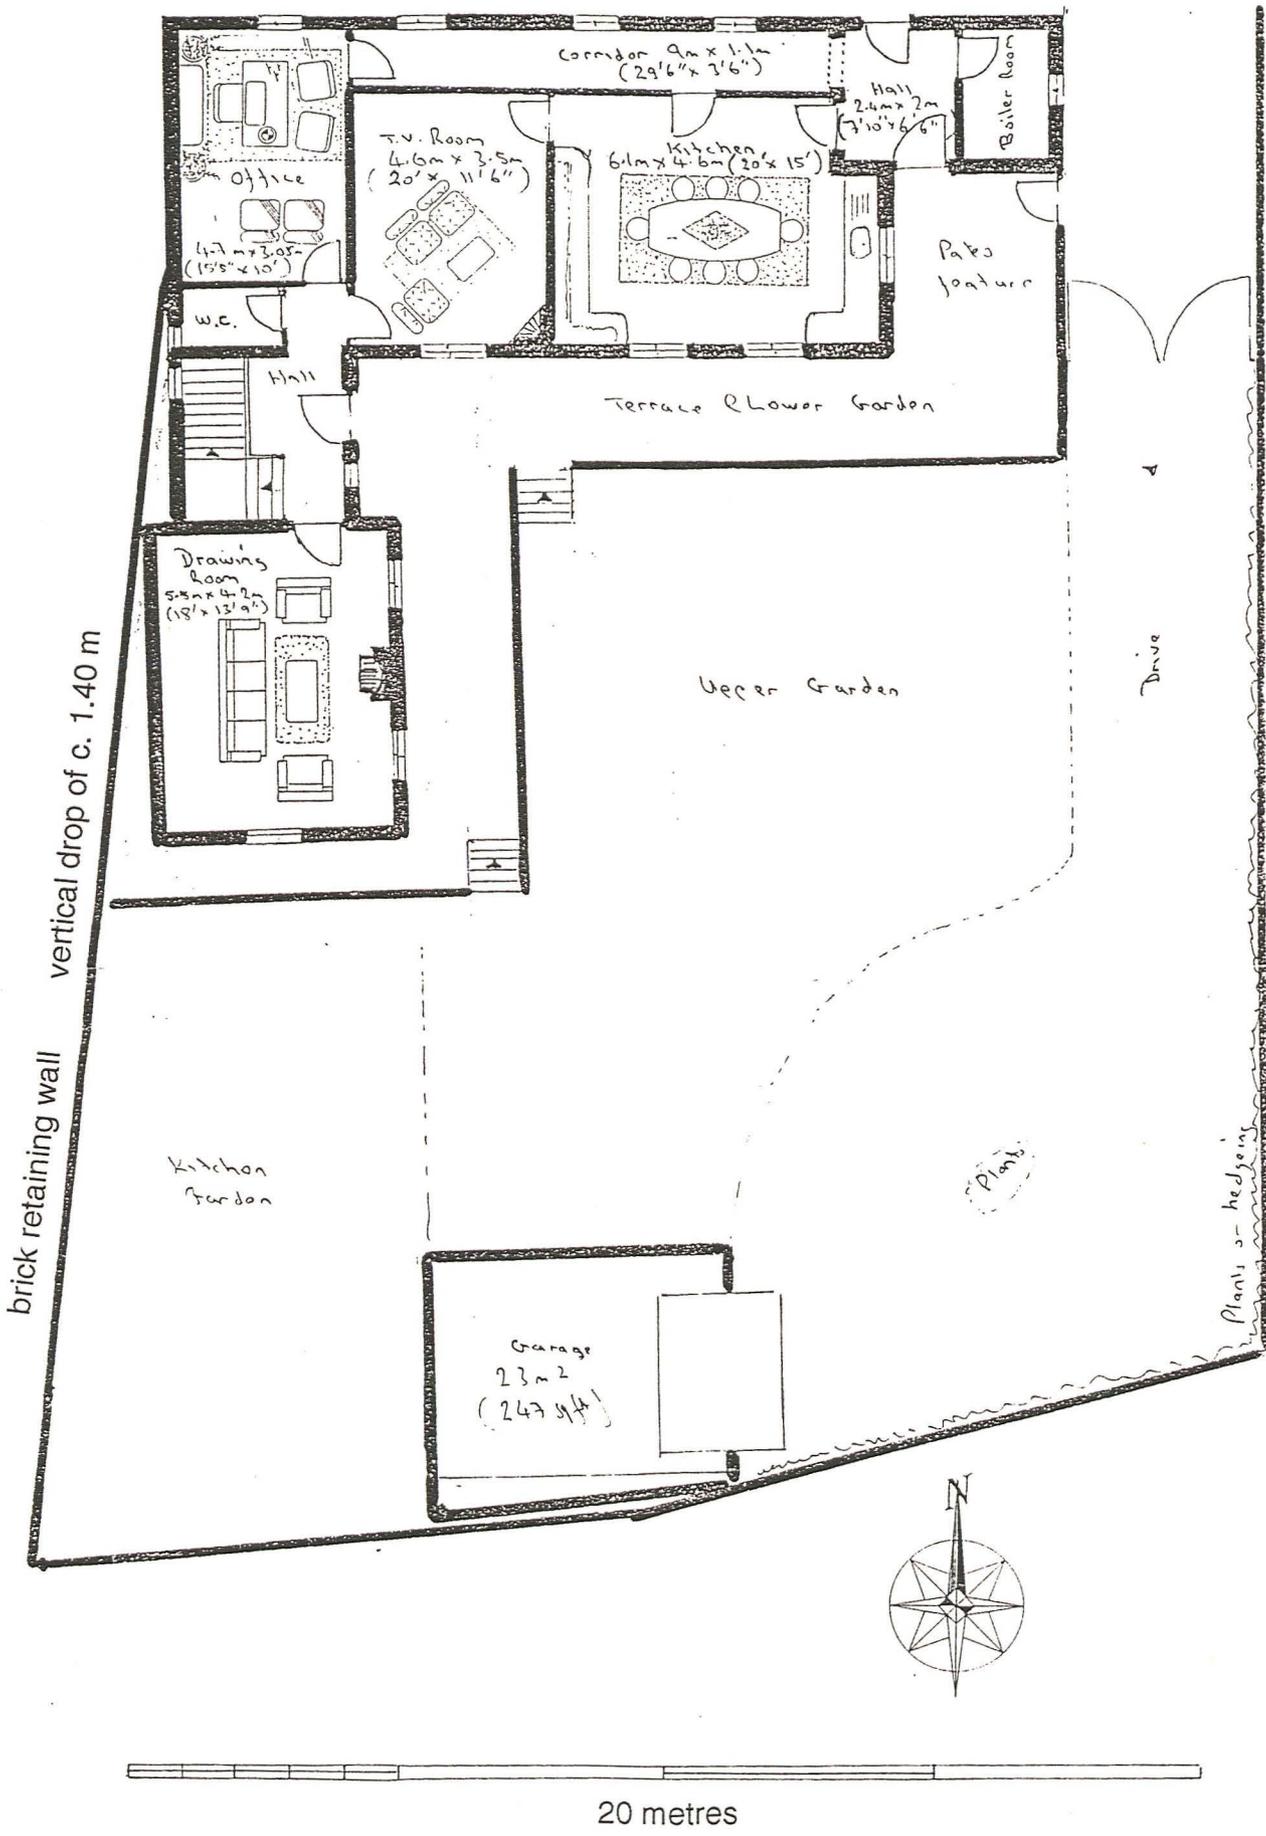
Former British Legion Club, Bank St, Caistor. Proposal for development showing extension to west of building, terrace and lower garden, garage and drive. (Plan supplied by Mr P. Kirke).
